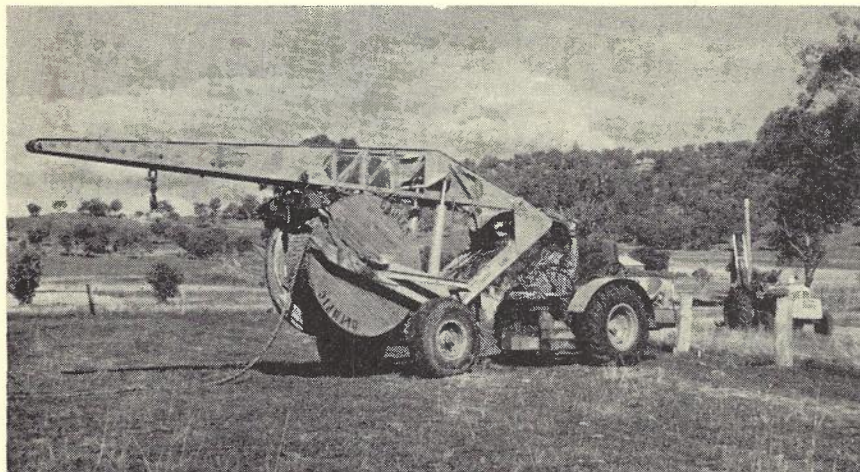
8-Ton Cranvel Crane and Cable Transporter Laying Out Cable.
